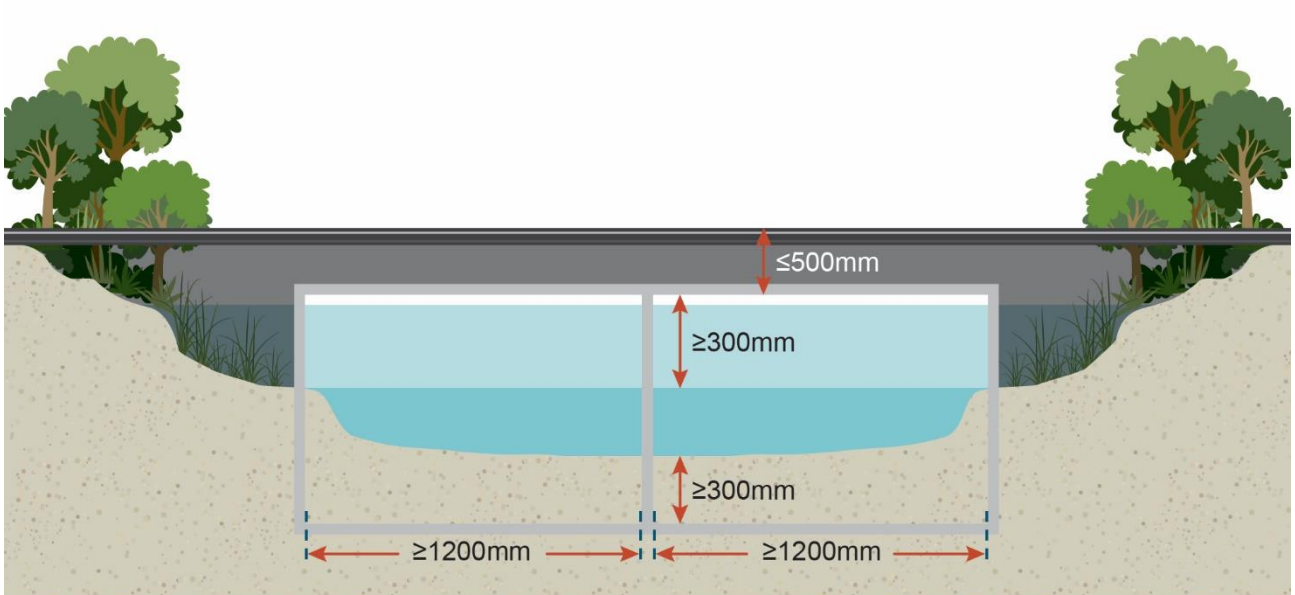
Culvert crossing (cross-section of waterway) – *amber* waterway
